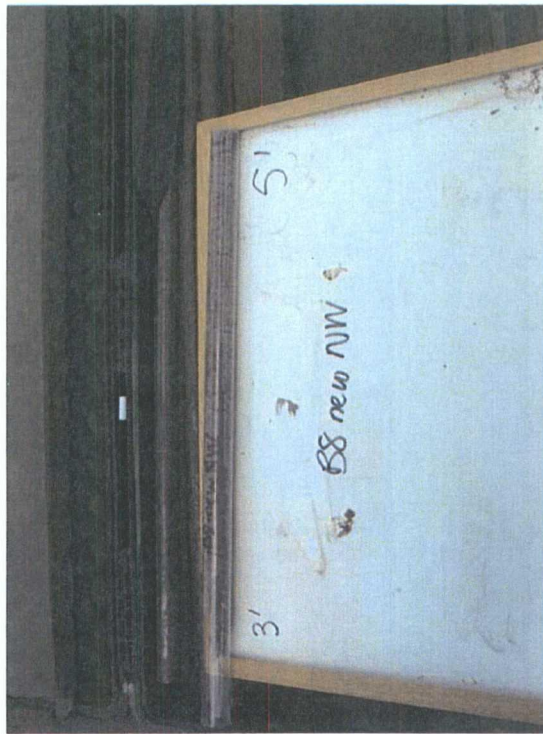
B8 new NW 5' - Sample on whiteboard: first half
